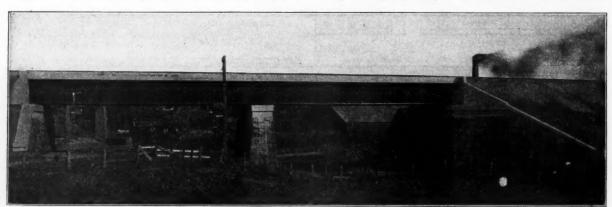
Deck Girder Spans with Type "D" Reinforced Concrete Floor.
